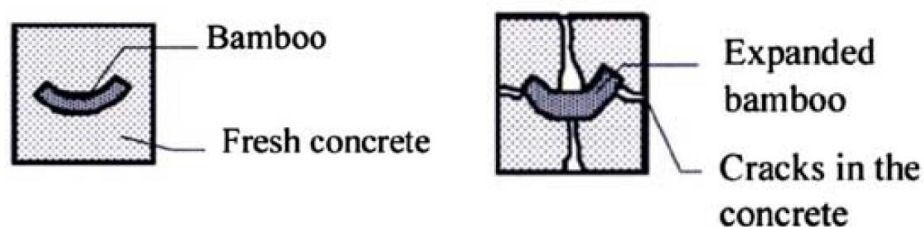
Swelling of bamboo during concrete curing causing cracks and premature failure.
